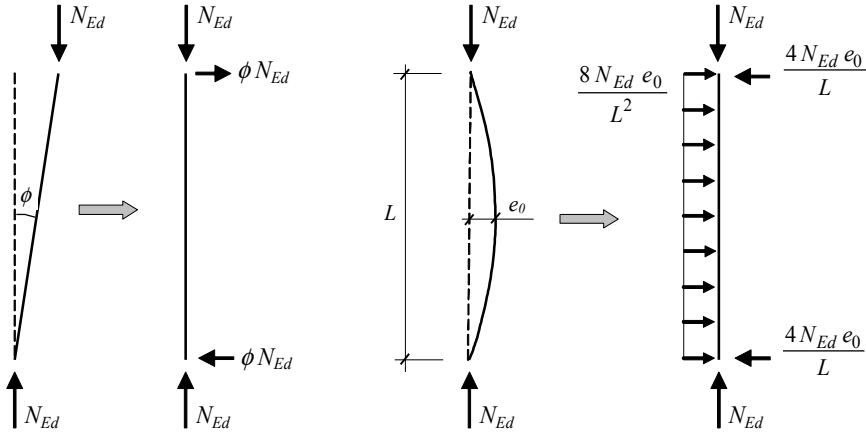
Imperfections and corresponding equivalent horizontal forces
